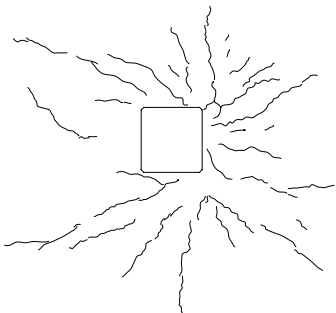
Level 3-2A and 2B Top of Slab Cracks (South 0.4% Roof Drift)
